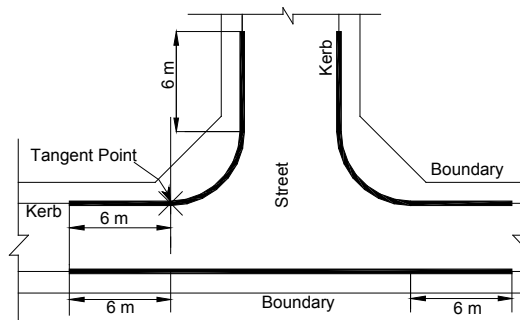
Restricted locations of driveways entry as shown heavy edged lines.
